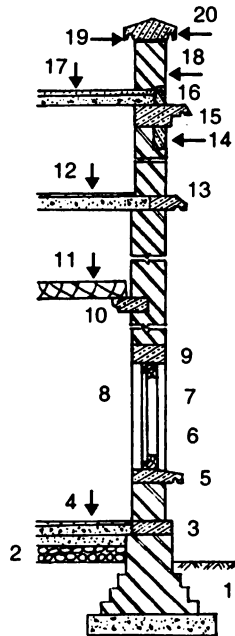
Section through a wall: 1. Foundation, 2. Hard core (Basement filling), 3. Plinth, 4. Ground floor, 5. Sill, 6. Window, 7. Reveal (revealed vertical wall on the sides of door or window frame as inner reveal and outer reveal), 8. Jamb (vertical wall on both sides of doorway or window opening), 9. Lintel, 10. Corbel, 11. Ceiling, 12. Upper floor, 13. String course with throating, 14. Frieze (stone course below cornice), 15. Cornice, 16. Blocking course, 17. Terracing, 18. Parapet, 19. DPC under coping, 20. Coping.
